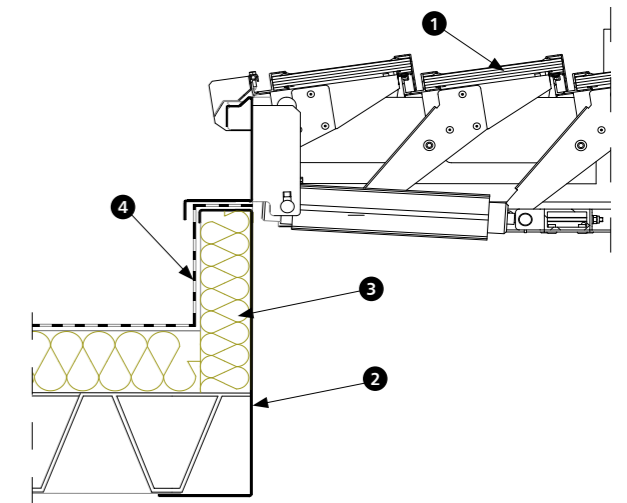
Installation of louvered vent with plinth type non-insulated base on a roof, on a steel plinth
